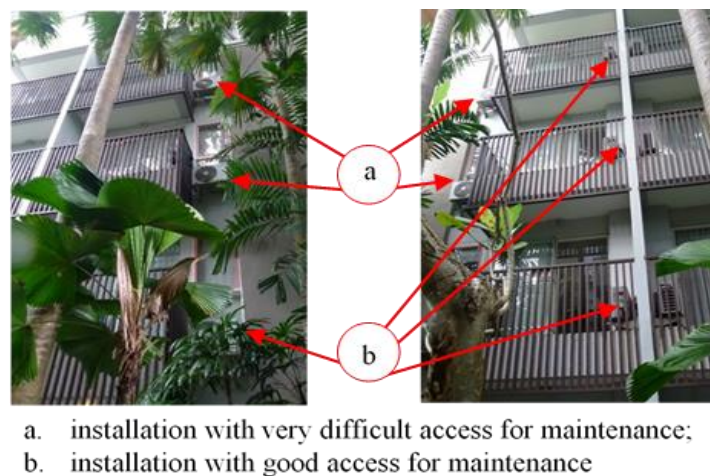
Outdoor unit installation of the AC system in residence buildings
